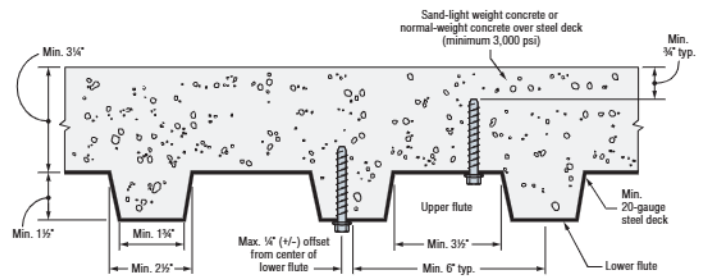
Installation of ¼"-Diameter Anchors in the Soffit of Concrete over Metal Deck
